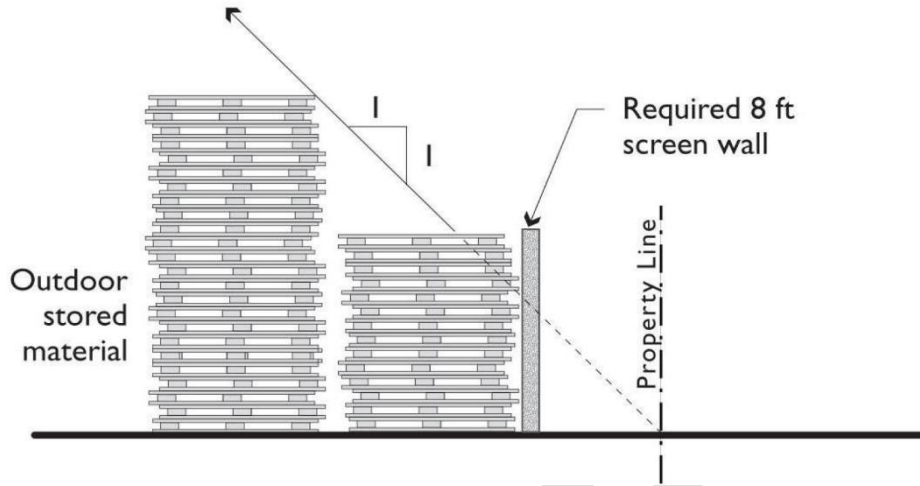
B.3: Outdoor Stored Material FIGURE 11-30-7.C(1)
